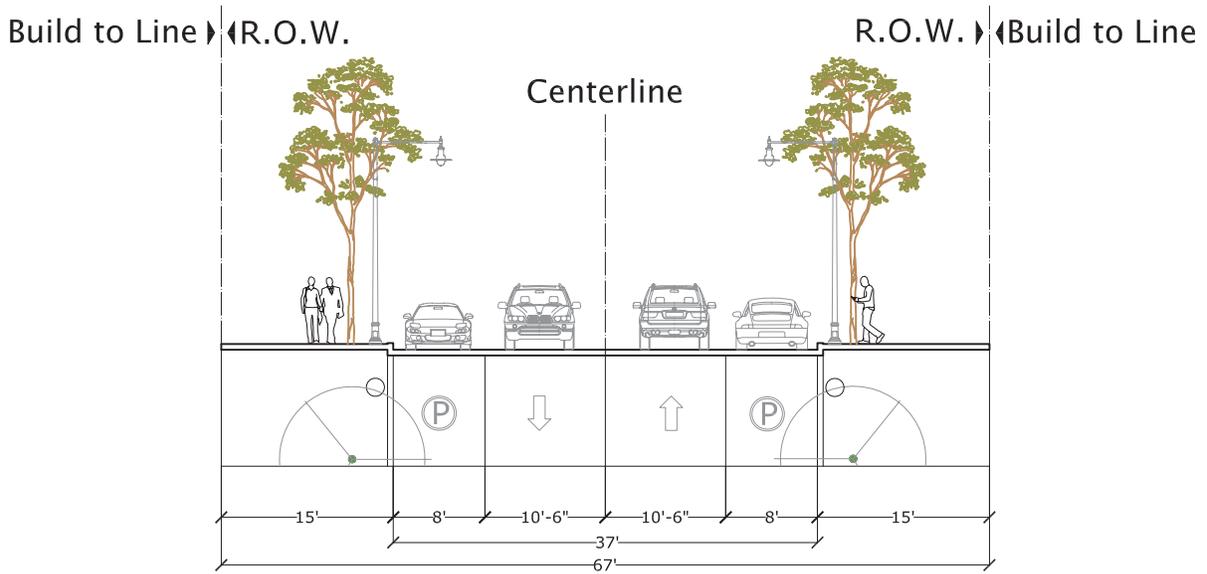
SECONDARY STREET A ST:67:37
